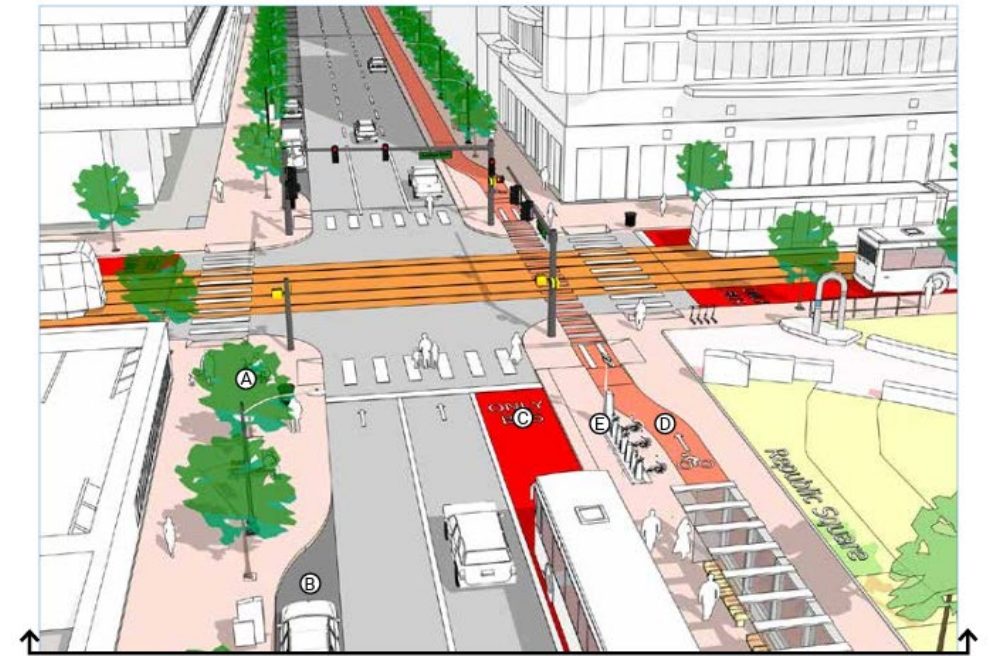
Fifth Street looking east at Guadalupe Street
